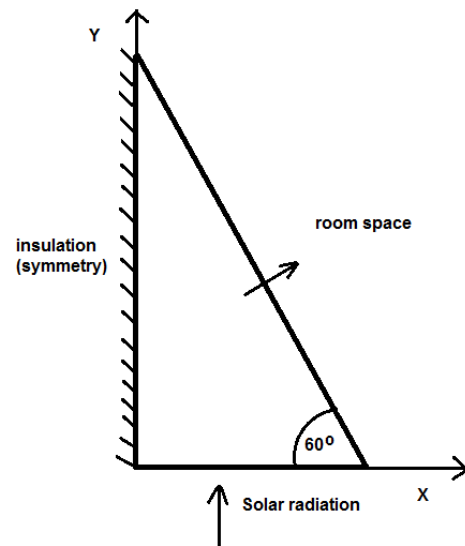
Schematic diagram of a cross-section of the prism wall.
